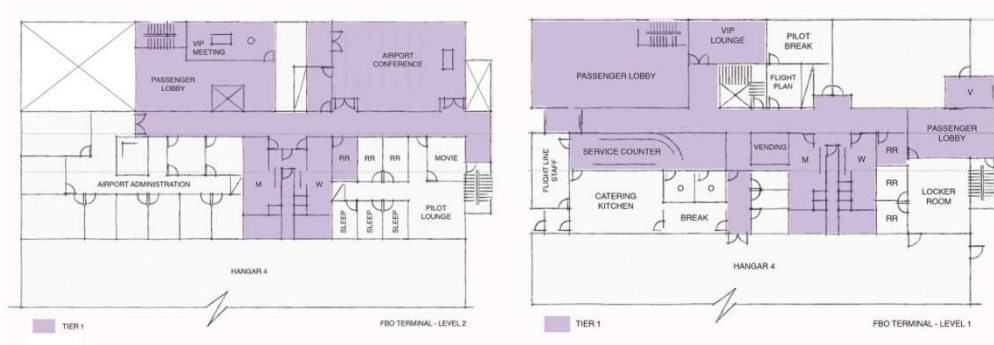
Tier 1 Key Plan (First Floor & Second Floor)
